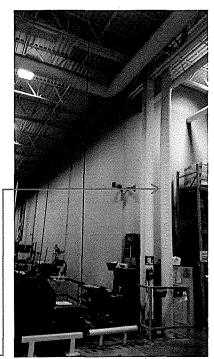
1301 Canal; typical return air duct to roof air exchanger, column C9.
